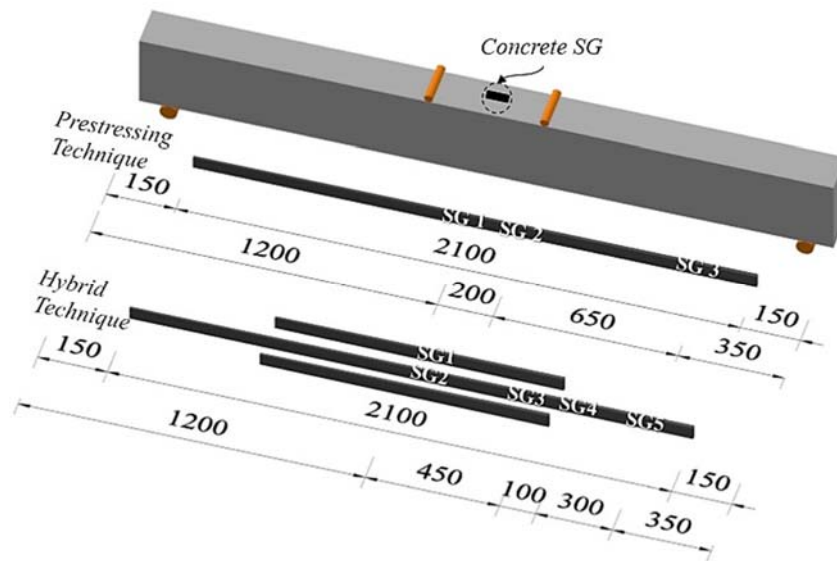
Position of the strain gauges (SG) installed on the CFRP laminates and concrete (dimensions in mm)
